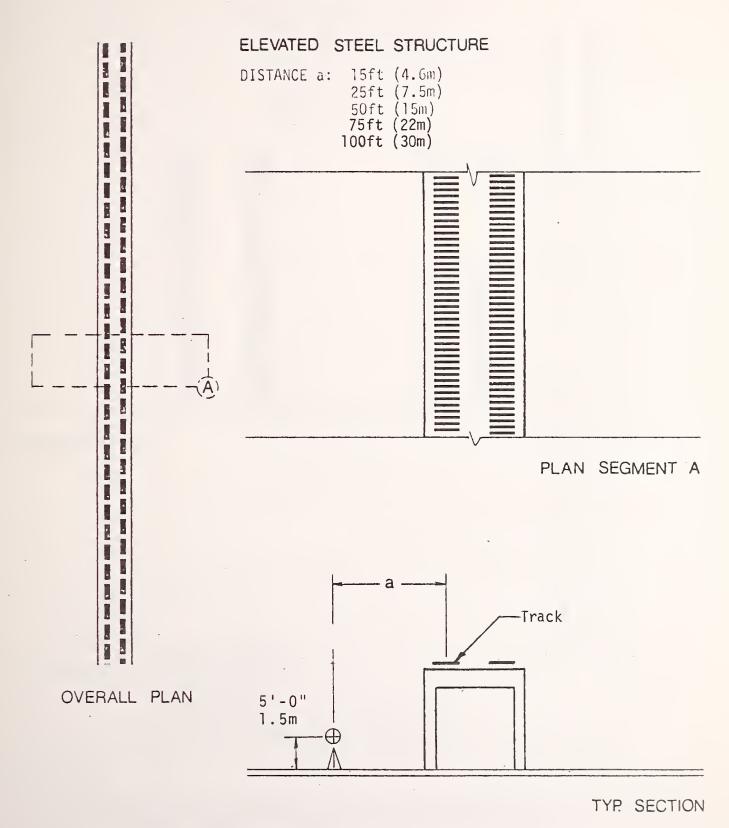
Wayside Measurement Location Adjacent to Elevated Steel Structures
